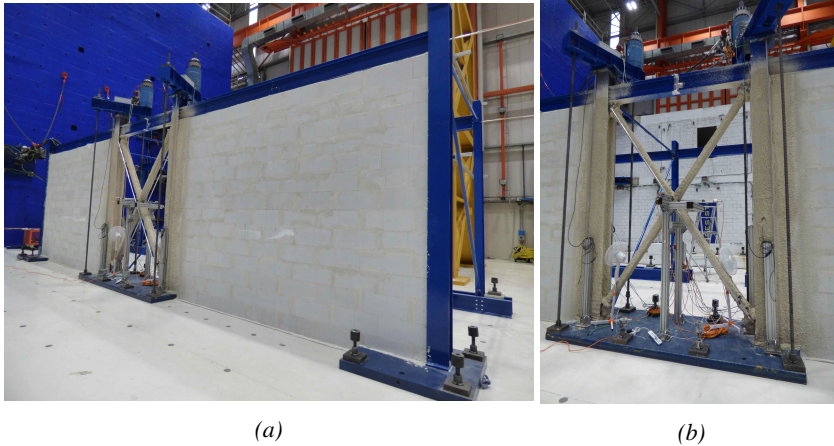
a) General view of the specimen and experimental setup at the ELSA Reaction Wall; b) detail of the brace.
